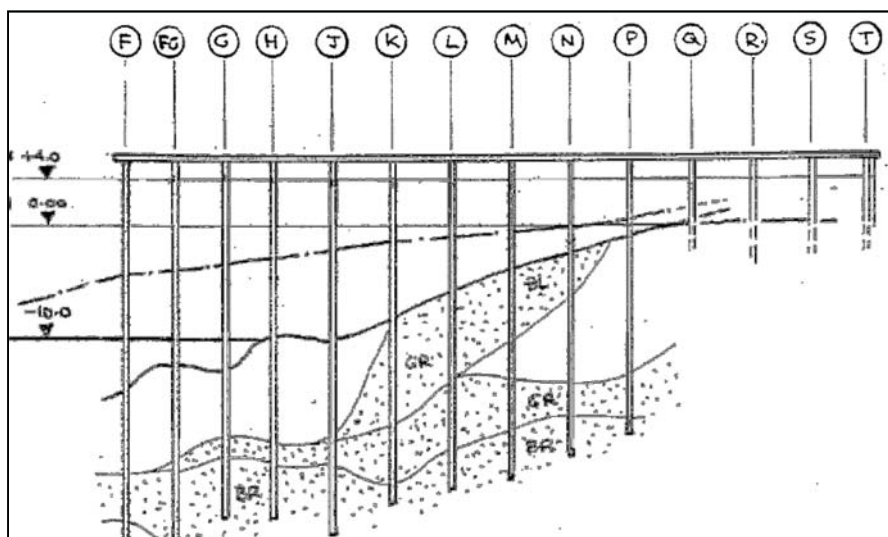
Cross Section through Berth 10 (as-built)
